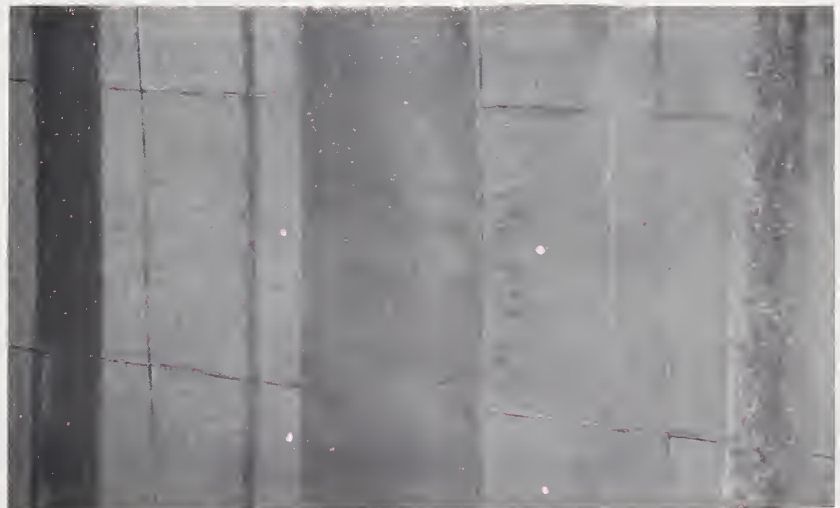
$\frac{3}{16}$ -in. asphalt tile, asphalt type, on concrete subfloor (test panel 15R).
